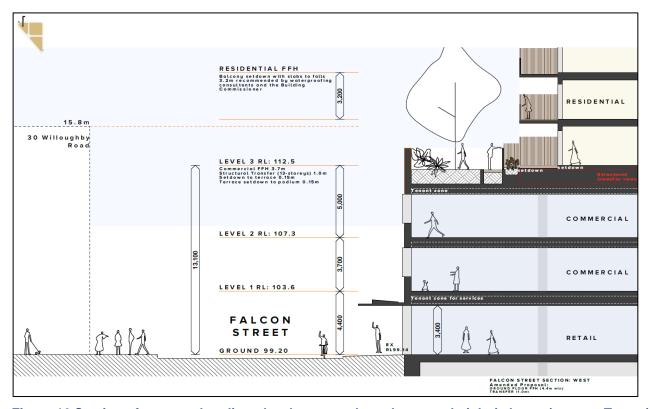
Section of proposed podium development where the street height is lower (source: Turner)
